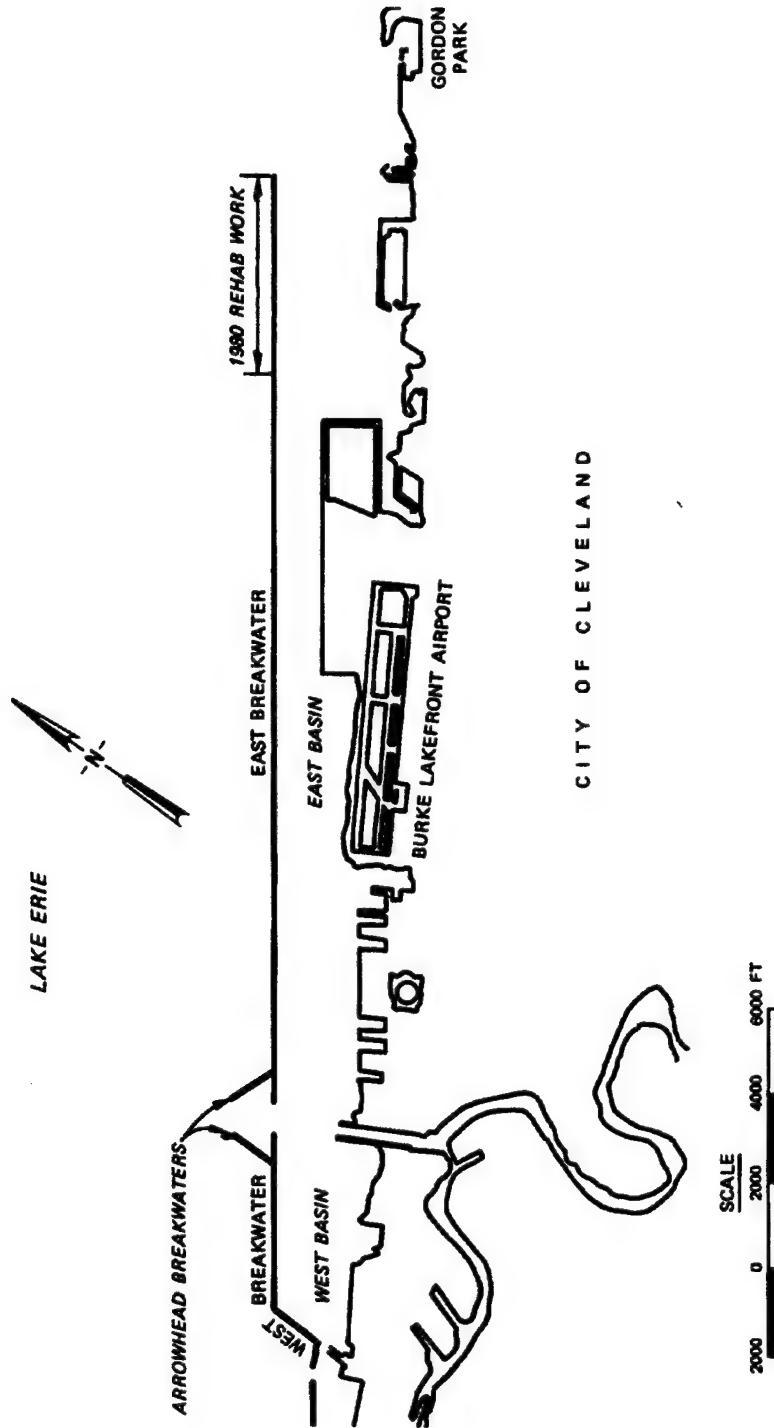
Use of arrowhead breakwaters at navigation opening
